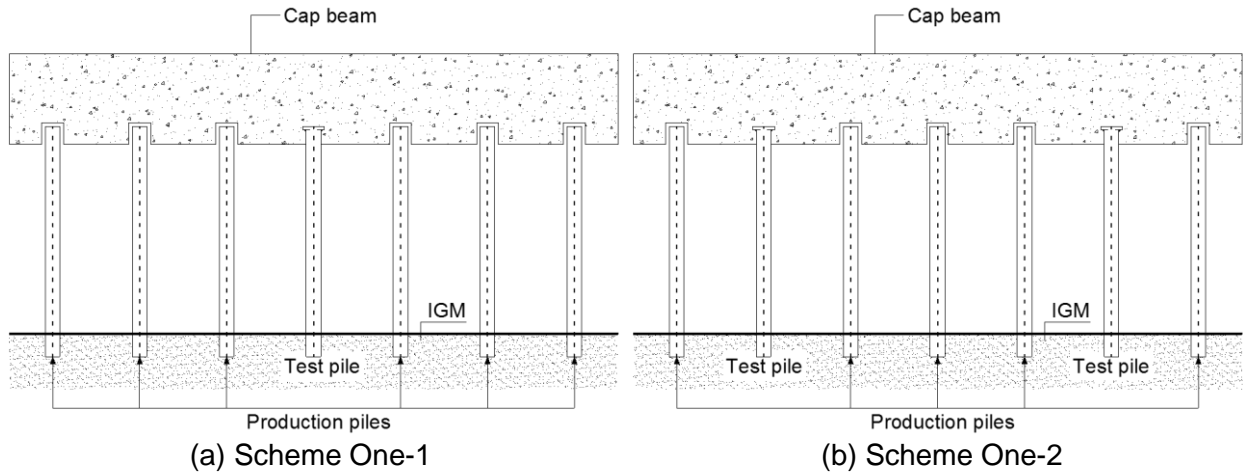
A schematic drawing of the proposed PBSLT Scheme One for (a) one test pile, and (b) two test piles.
